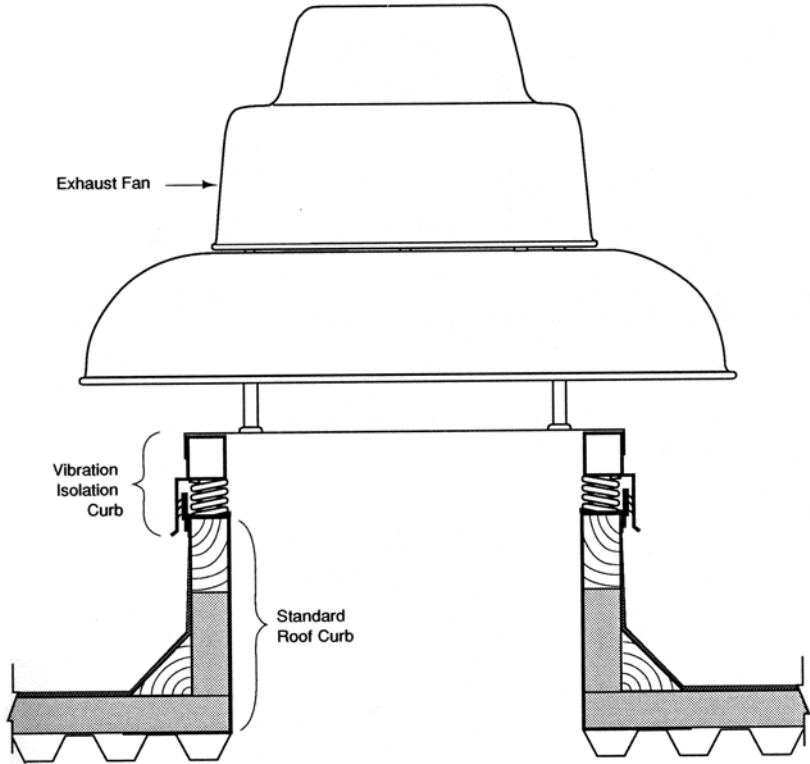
Mushroom type exhaust fan on vibration-isolated roof curb.
